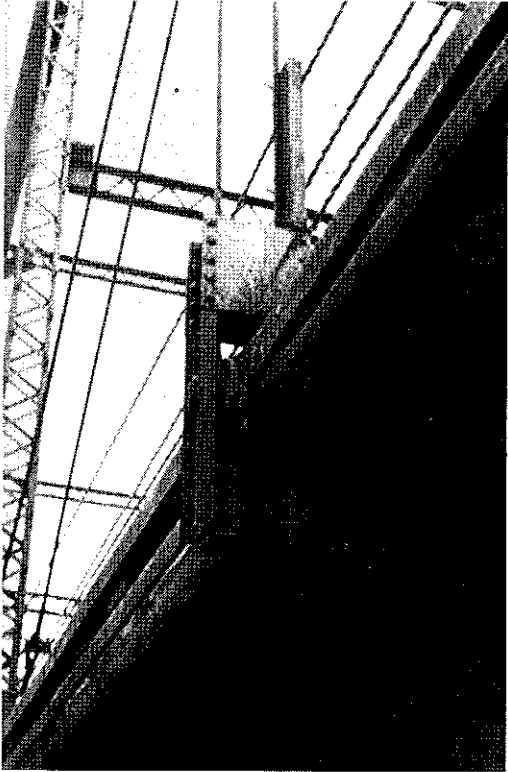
Photograph of typical connection of floorbeam to truss at hanger member.
